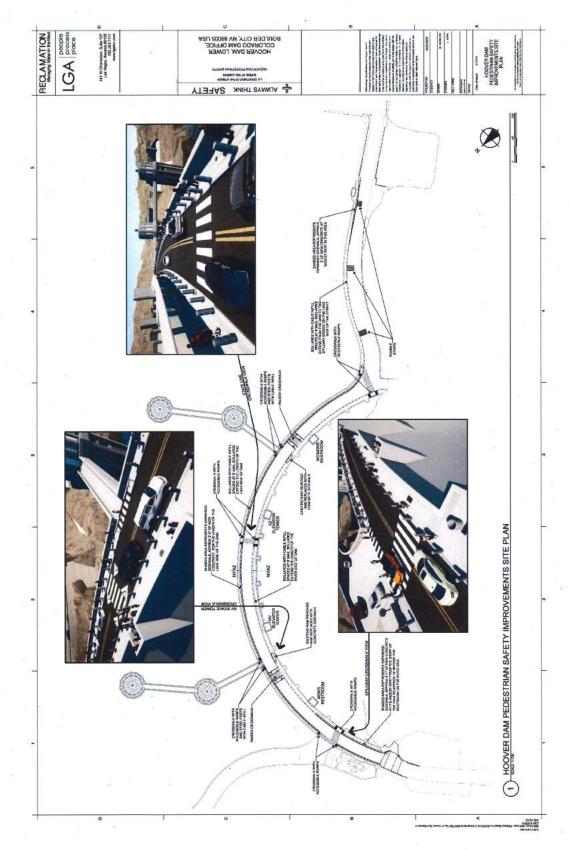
Proposed bollards, fencing, and crosswalk at Hoover Dam.
